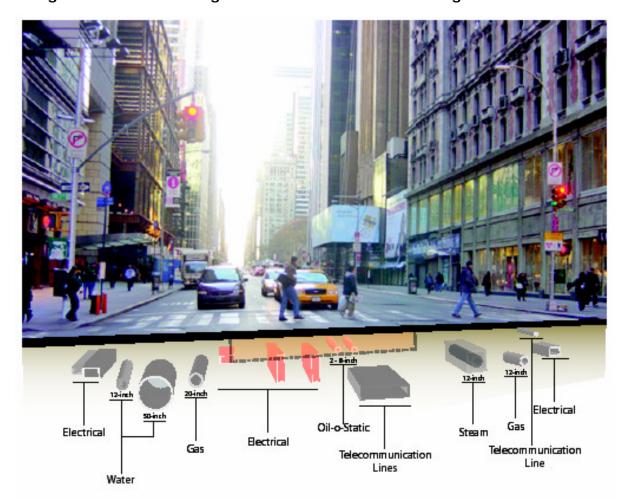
Utilities needing to be relocated out of the rail alignment construction area
